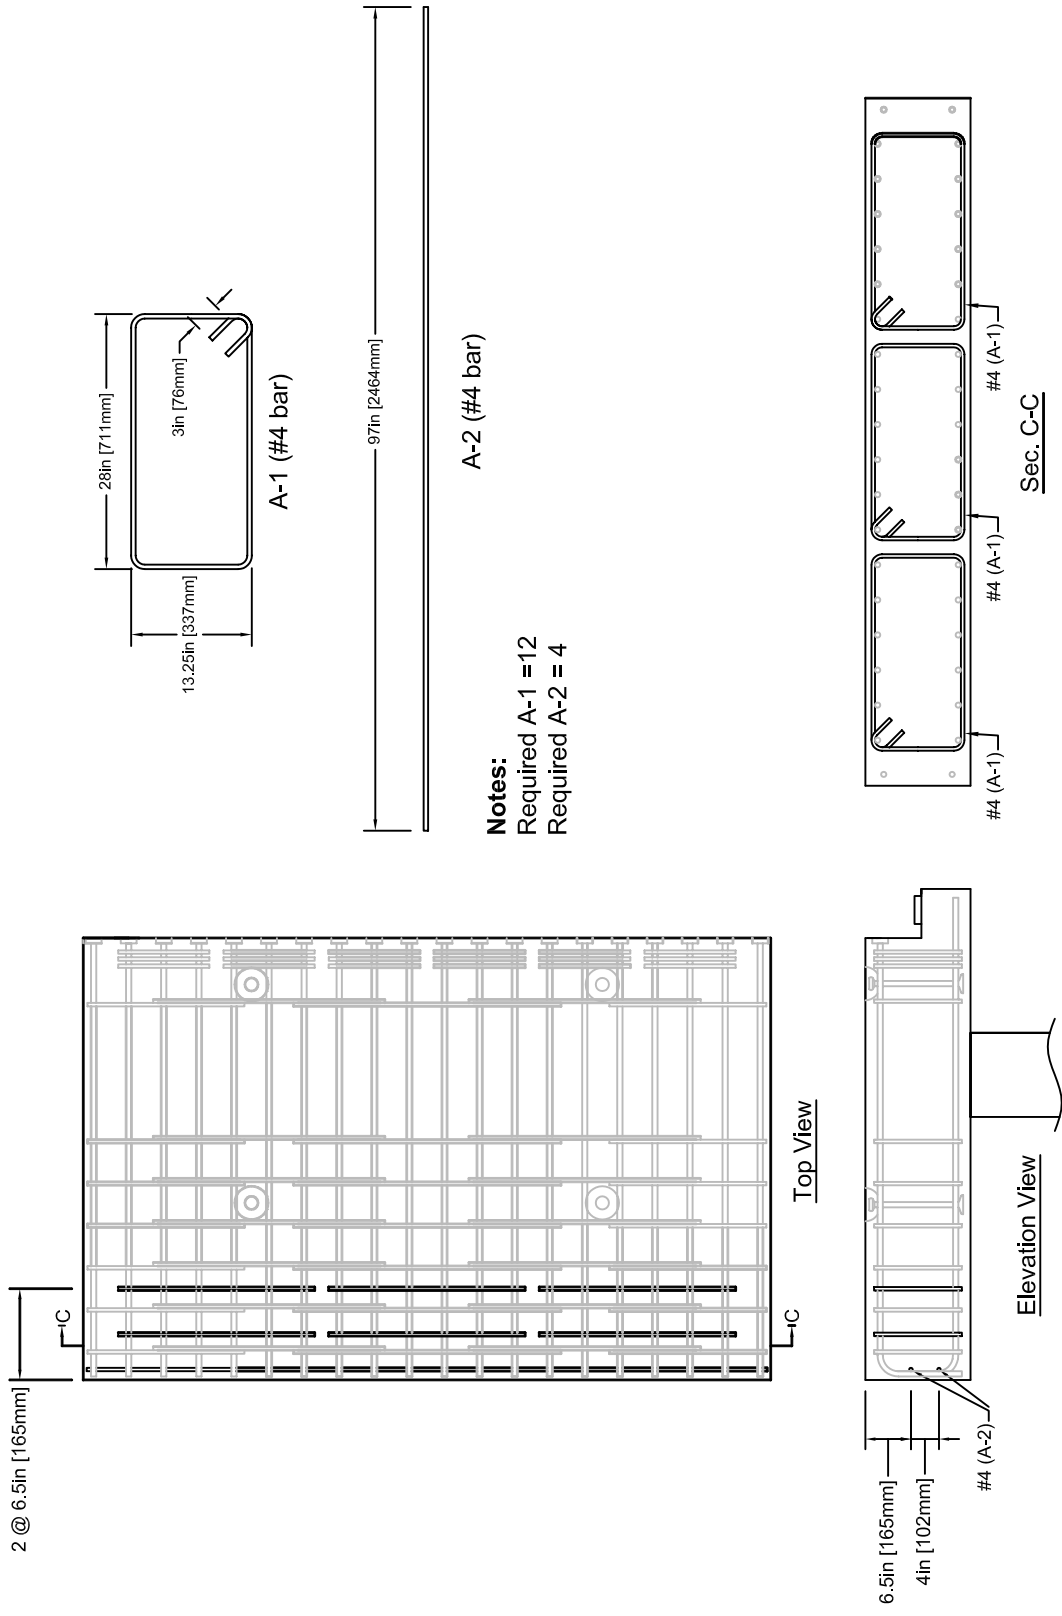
Additional reinforcement required in cantilevers for anchorage zones.
